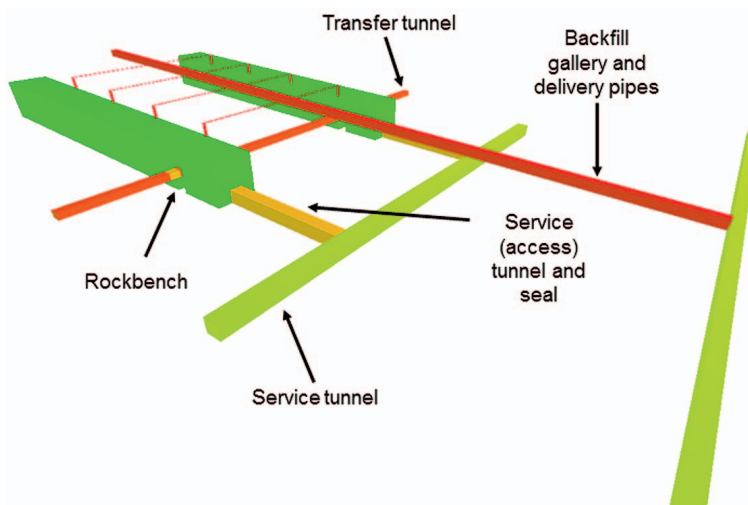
Vault scale model in higher strength host rock. The rock and excavation damaged zone (EDZ) are not shown.
